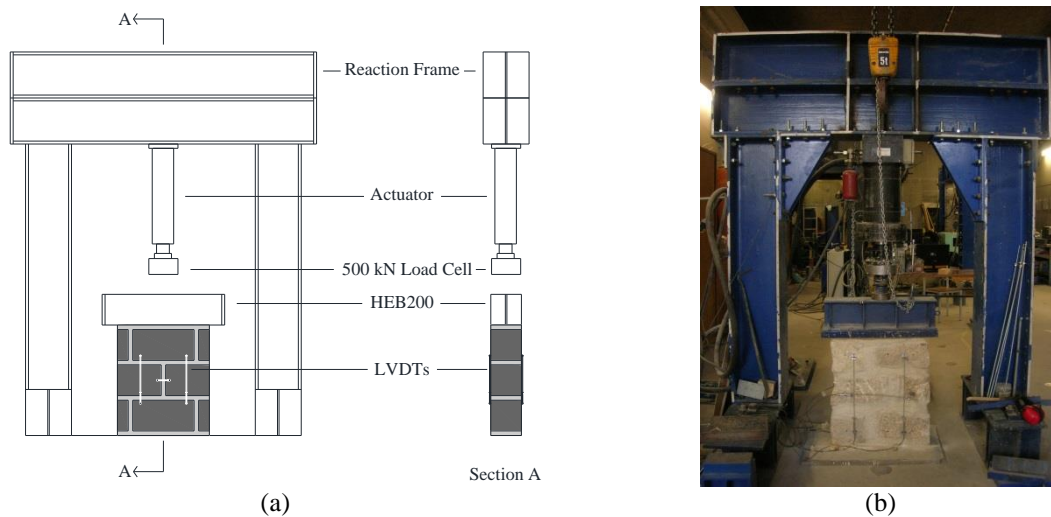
Complete test set-up for small masonry wallet tests: (a) schematic; and (b) photo
